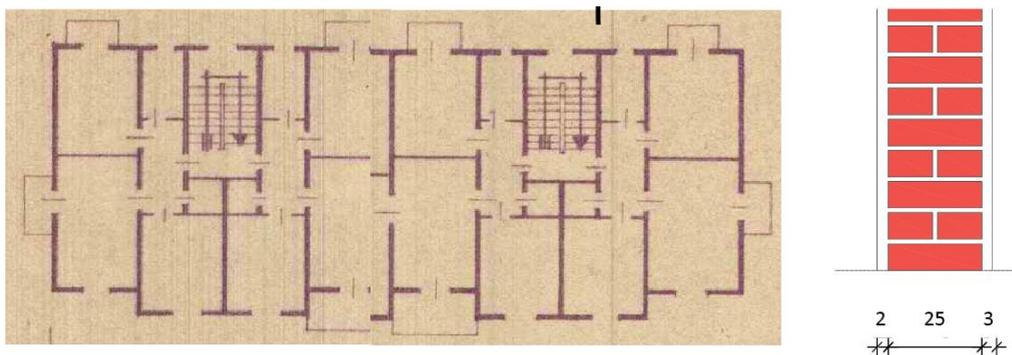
The first multifamily house plan and detail of the perimetral wall.
